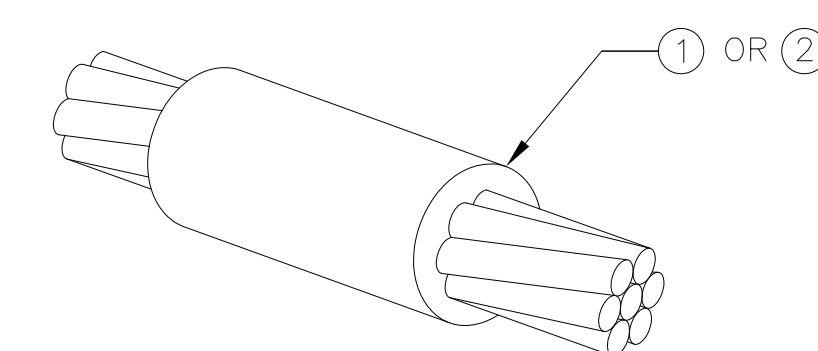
GROUND WIRE TO WIRE LUG-COMPRESSION CONNECTION
